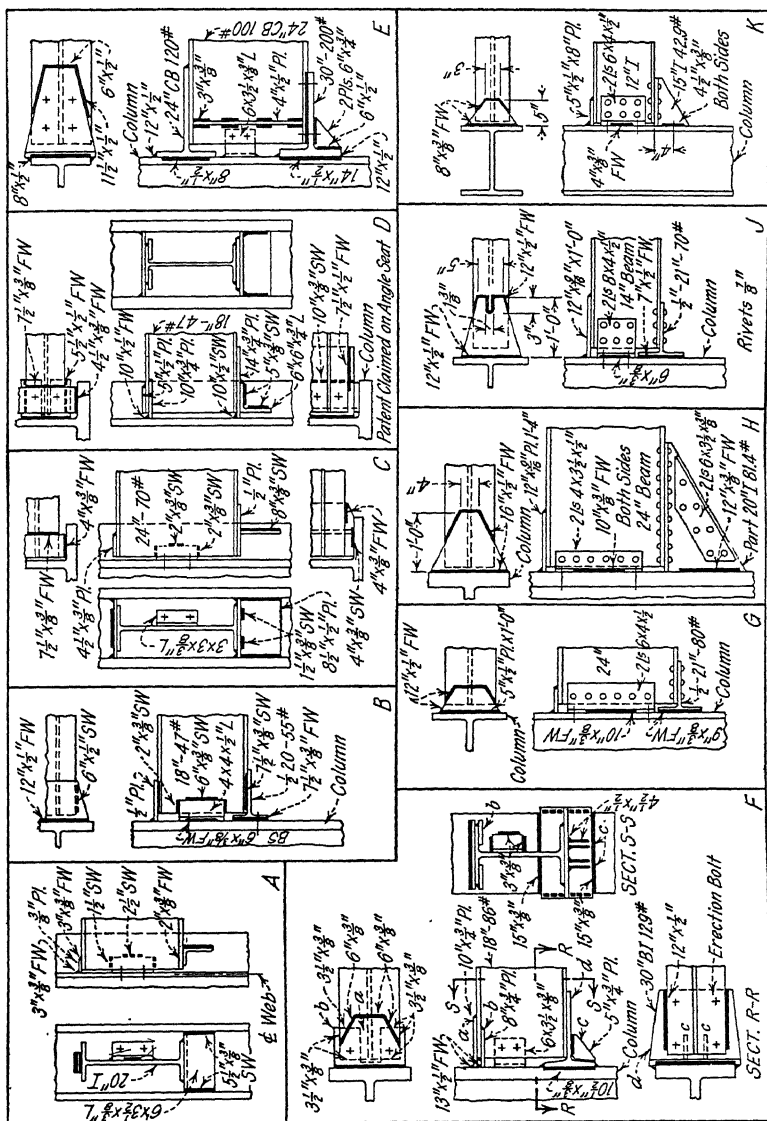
Structural Details. Sketches of Connections to Columns in All-Welded, and in Shop-Riveted, Field-Welded Buildings.
